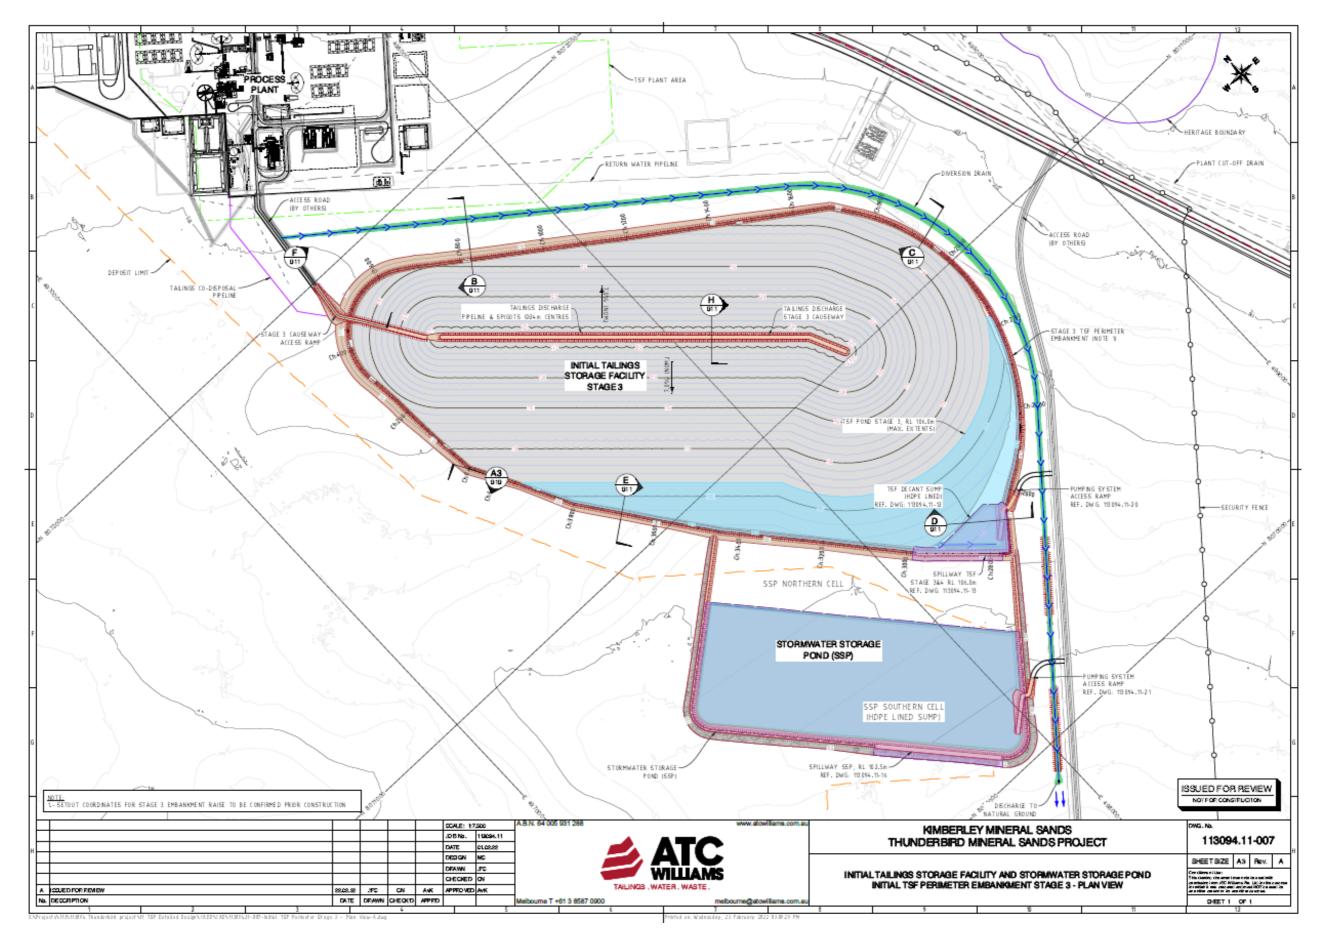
Drawing – Initial TSF and SPP, TSF perimeter embankment stage 3 plan view
